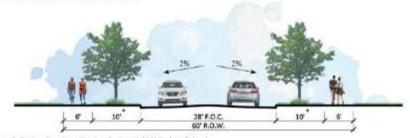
A: Urban Collector Roadway Design Option A (60' Right-of-Way)
